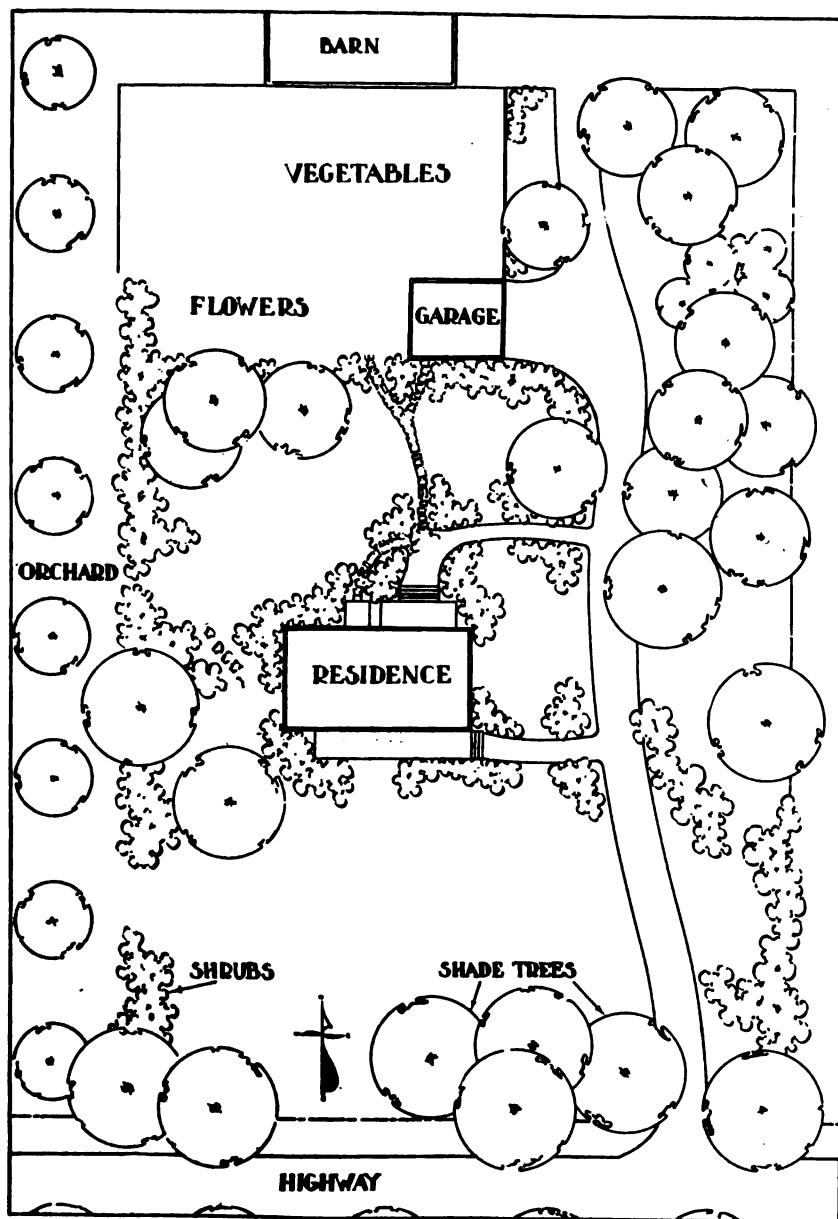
A design of walks, drives and plantings of a farm grounds where the buildings had already been placed.
